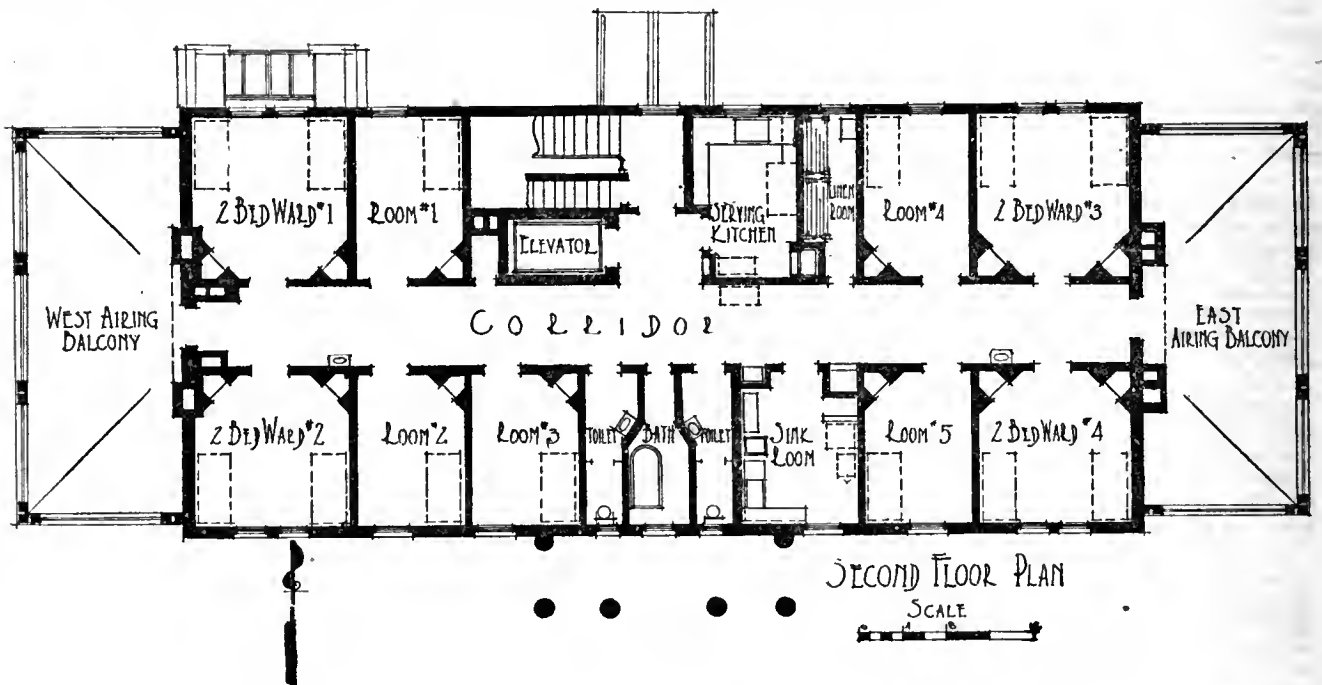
Second floor plan: Attention is called to central location of stairway, elevator, serving kitchen, toilets and bath, there are five private rooms and four two-bed wards; at each end is a large airing balcony.
